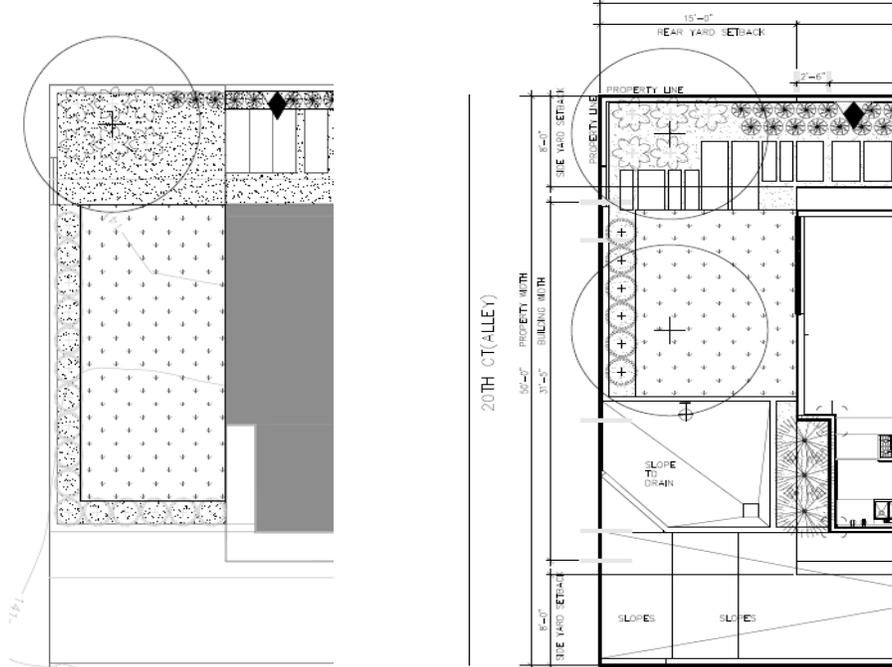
Original and Revised Rear Landscape Plan (respectively)
